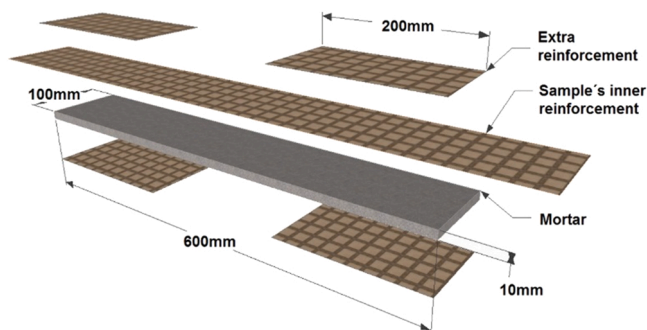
TRM specimen dimensions for uniaxial tensile test.
